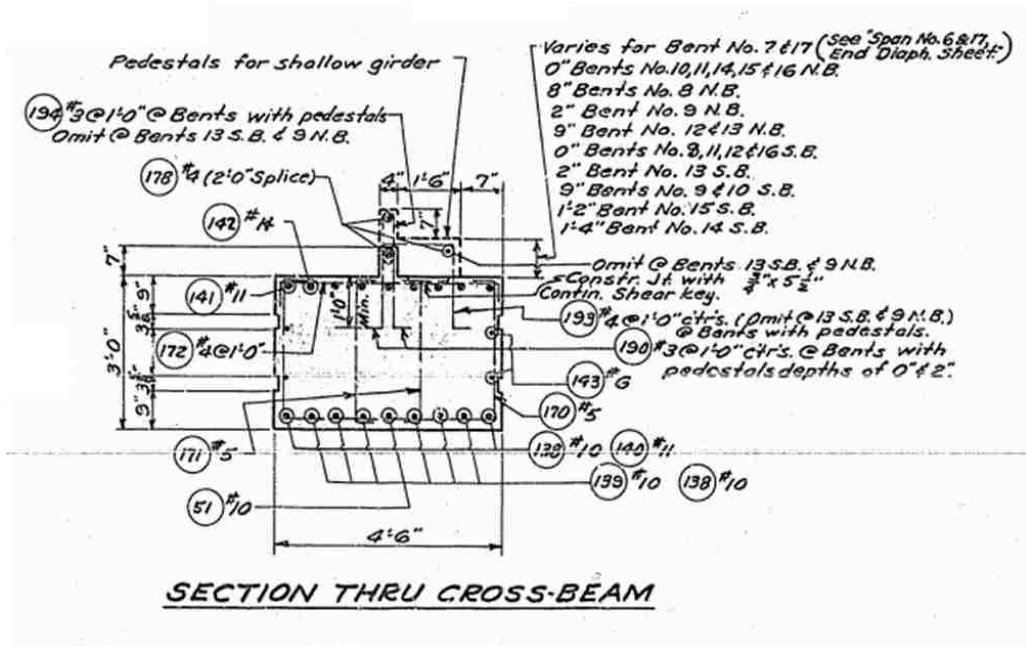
Cap beam cross-section for typical bent (Ravenna)
